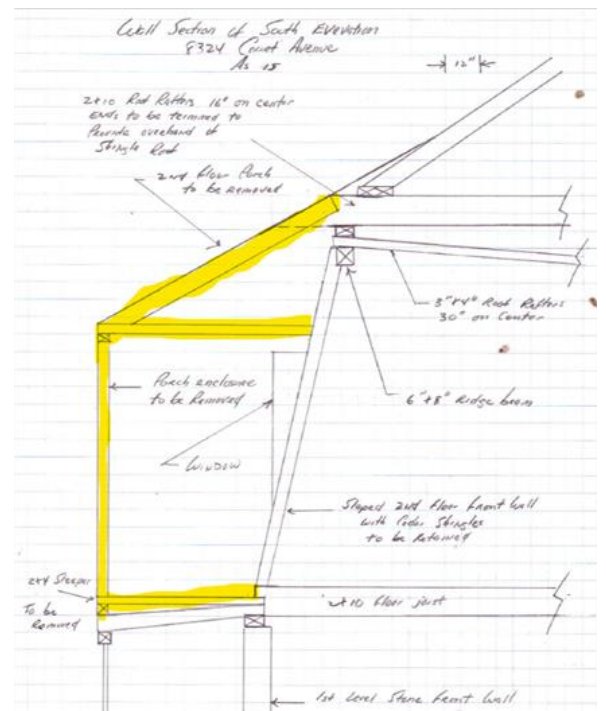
Section of porch – Highlight showing the enclosure to be removed to expose mansard roof.
